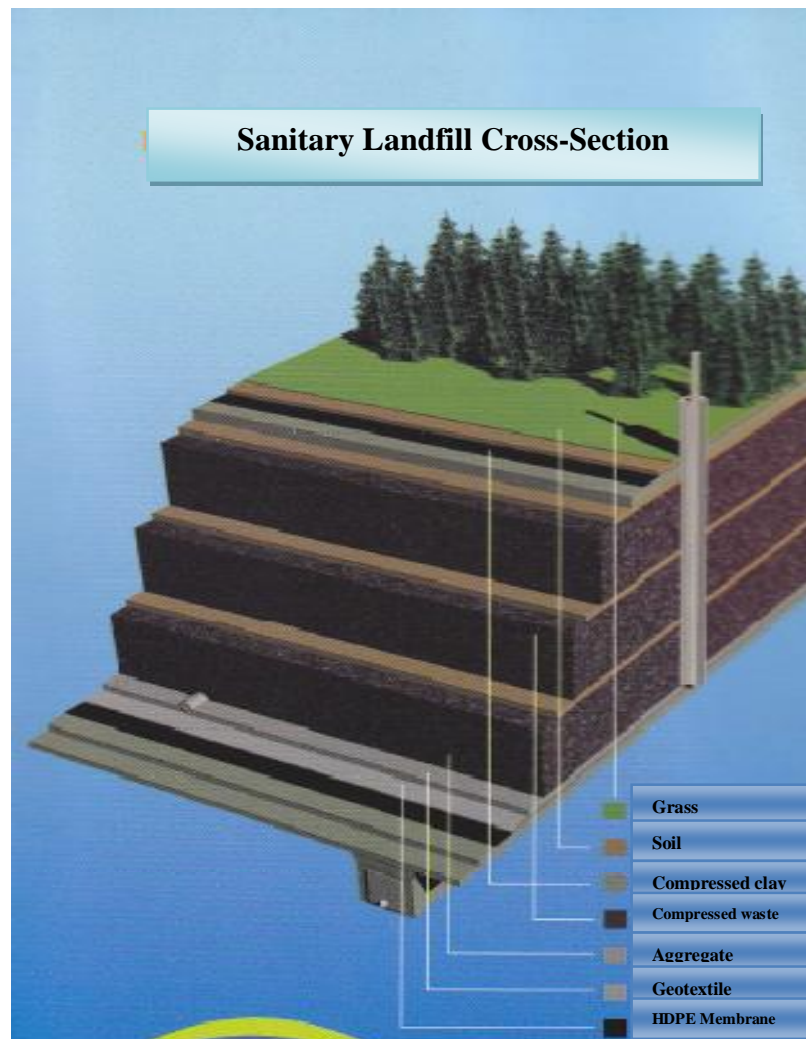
Cross section of a typical Platform (İSTAÇ, 2010)
